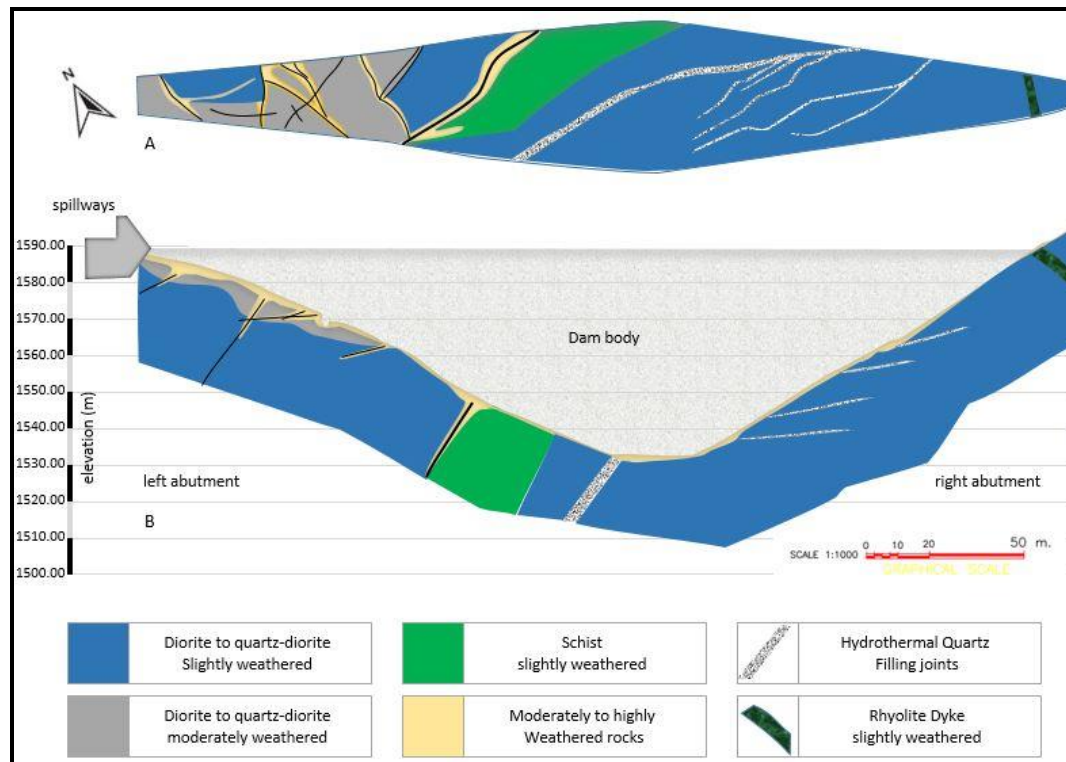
Geological setting of the dam site. A) Plan view of the dam body, B) Cross-section of the dam site (modified from Mohab Ghods Consultant Engineers, 2017).
